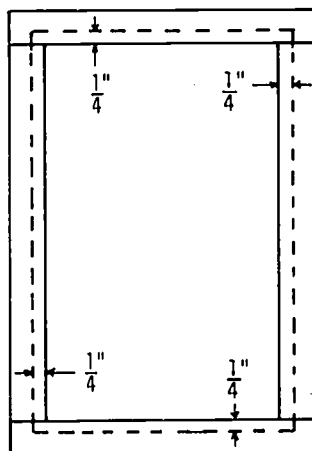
A-1. Interior View of Window Frame, Showing Layout Lines $\frac{1}{4}$ " from Inner Edges
